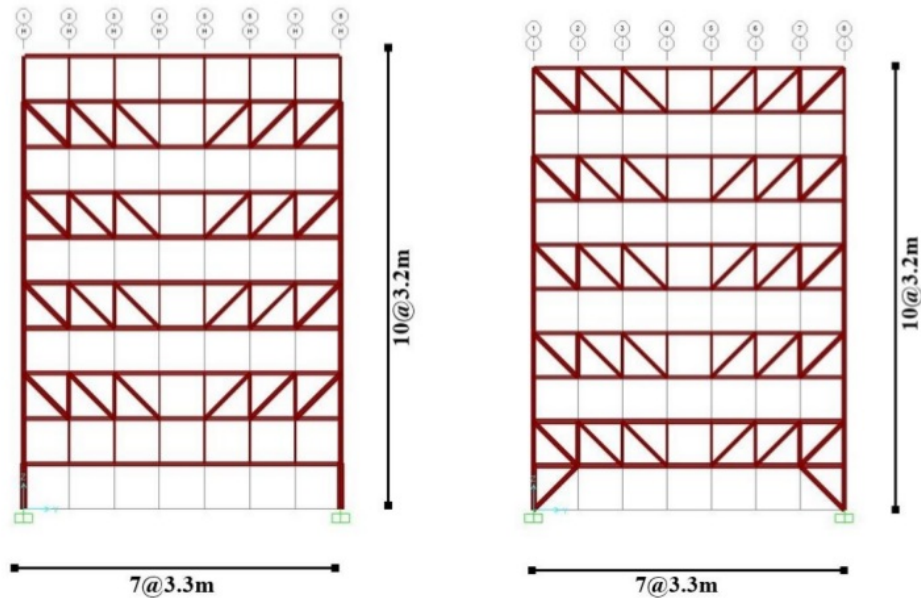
Staggered Truss Frames (STS) in row (a) and row (b)
